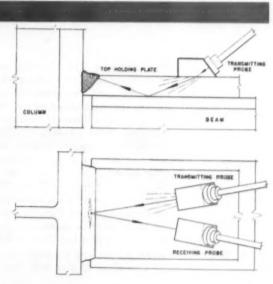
ECHO TECH-NIQUE bounces pulse from underside of plate into weld and back to probe.
